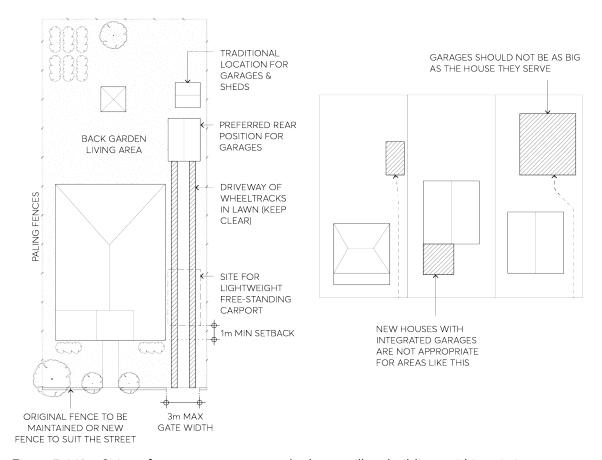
Siting of garages, carports, and other ancillary buildings within existing patterns and new subdivisions
